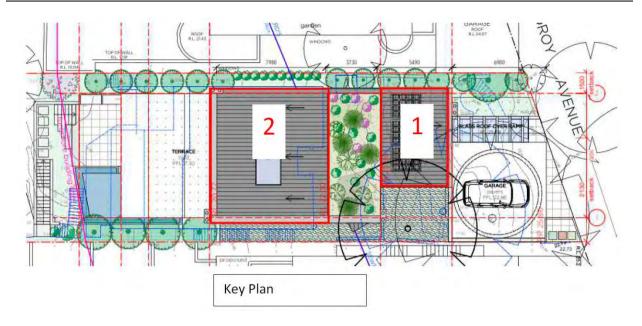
Key Diagram showing the two roof sections of the proposed dwelling which exceed the height control of 8.5m. Roof area 1 is above the lift and stair well (see detail in Figure 48). Roof Area 2 is above Level 03 the upper level open plan living area (see detail in Figure 49).
